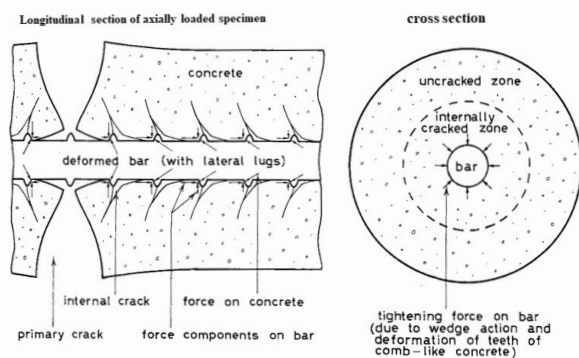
Internal cracks around reinforcing bar embedded in concrete (8).
